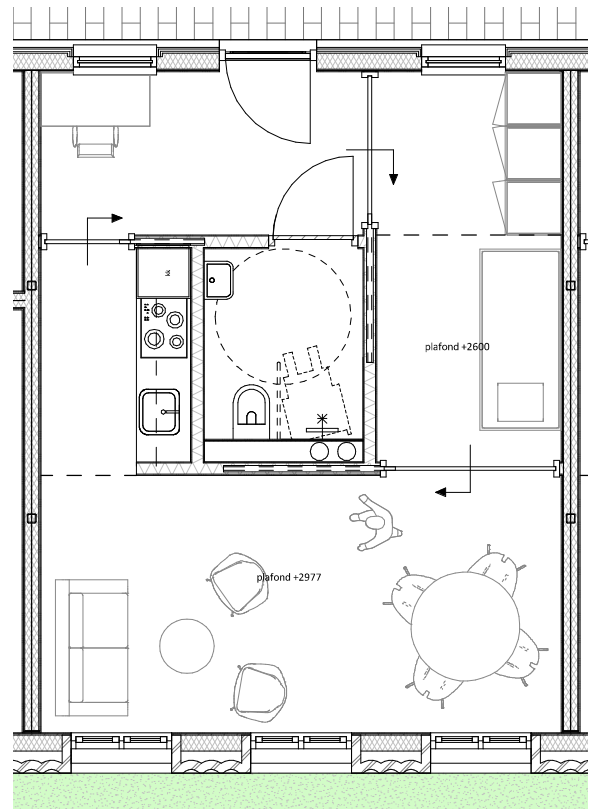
Design flexible dwelling floor plan based on Duinker & Van der Torre
